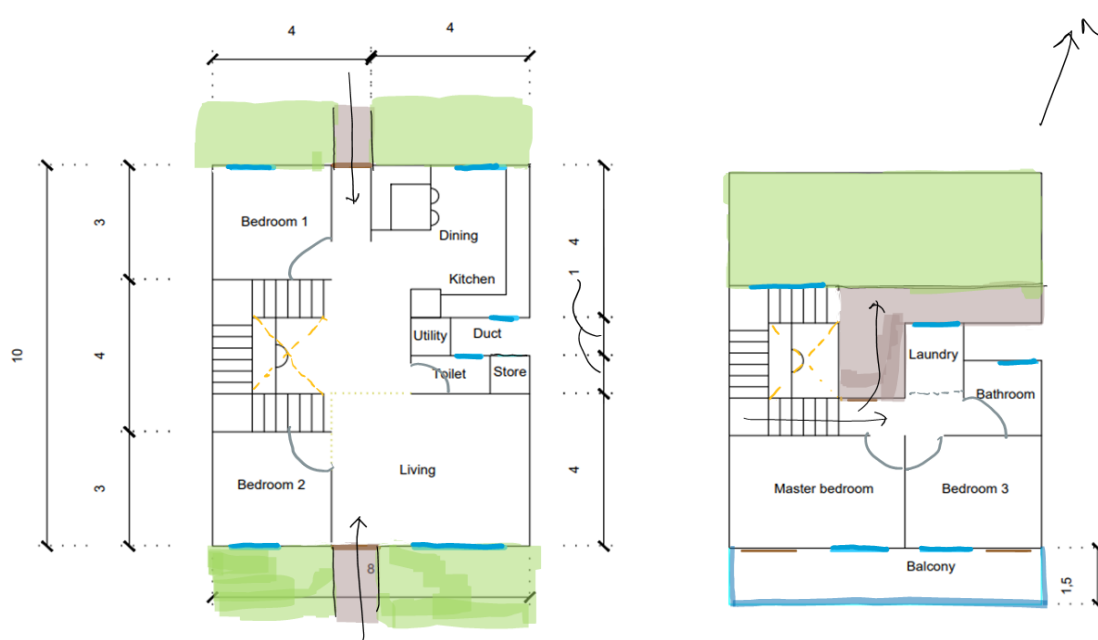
Four-bedroom house floor plans - ground floor plan (left), first floor plan (right)
